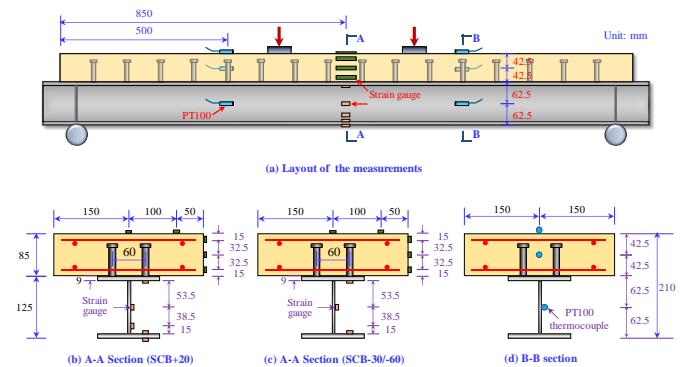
Layout of strain gauges and thermocouples used in the bending tests on SCCBs
